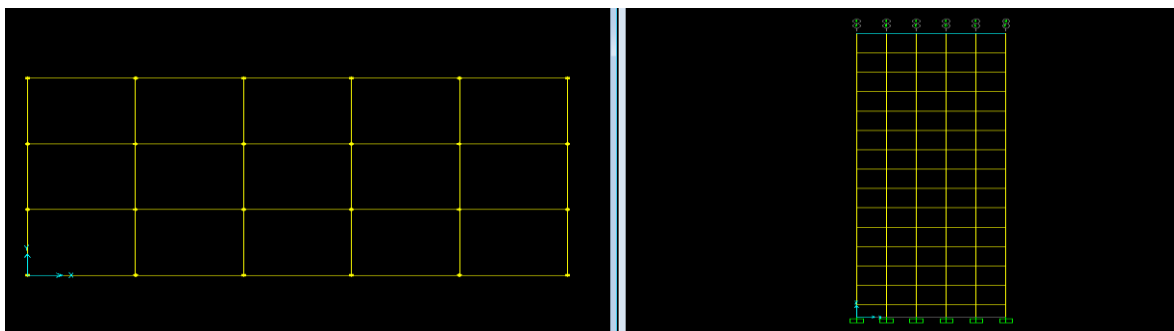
Plan And Elevation Of (G+13) Storied Building
